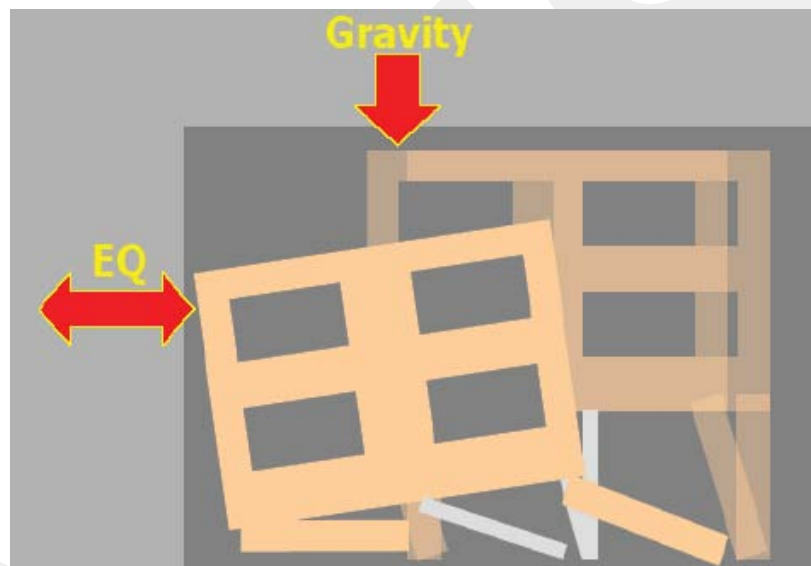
Collapse mechanism of a building structure having a soft story [4].
